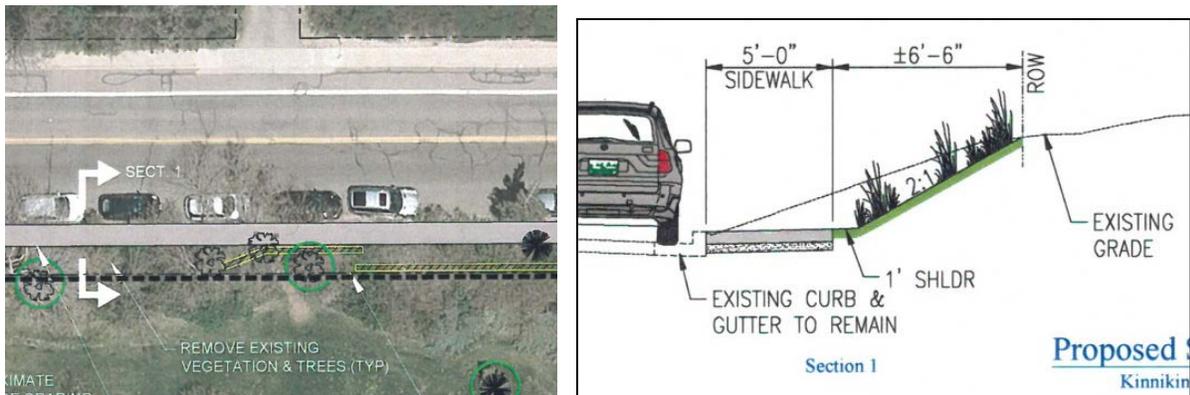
& 13. Design concept along Baseline Road (left) and details (right) between Grant Place and 9th Street.
